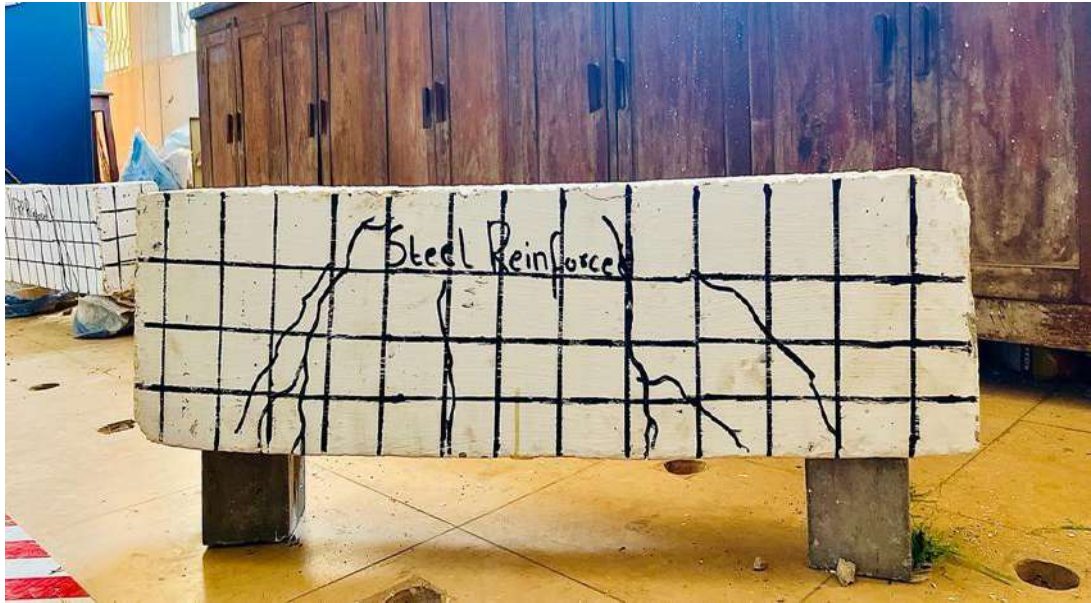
18: Cracks Pattern in Steel Beam 2
